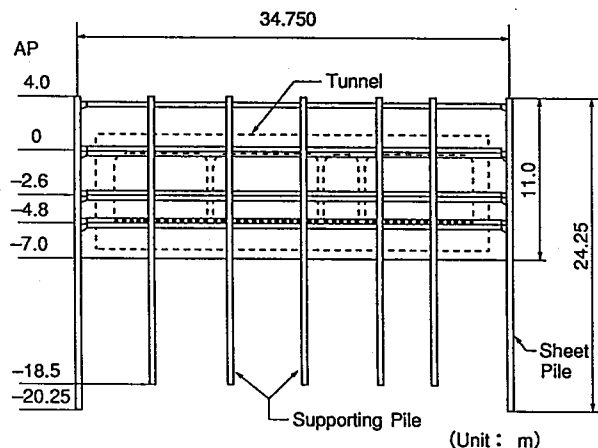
A Typical Cross Section Showing Bracing Method (Tanaka et al., 1989)
